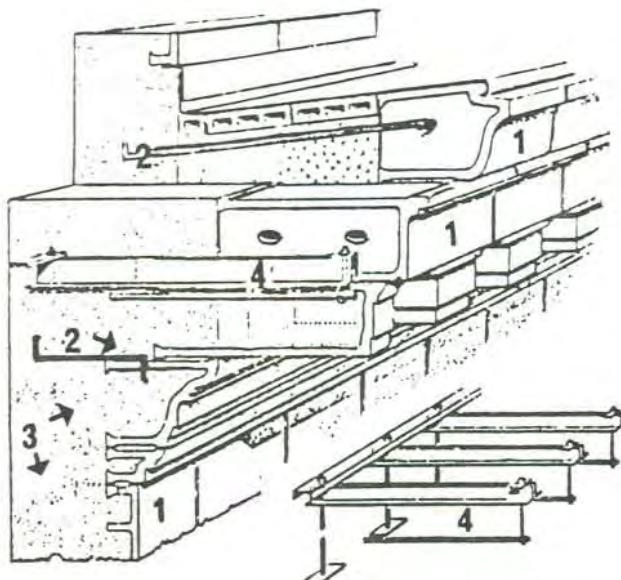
Typical Construction Detail of Glazed Architectural Terra-Cotta Ornament. Construction detailing was often complex. The terra-cotta units (1) which were laid in mortar were fitted with holes or slots to receive the metal anchors (2) (often called "Z" straps or "light iron") which were often fitted directly to the building frame. Masonry backfill (3) (either brick or poured cement) was laid between the terra-cotta units, with the building frame encasing the metal anchor. Overhanging or protruding elements were further secured by metal dowels or outriggers (4). (Detail, Architectural Terra Cotta, Charles E. White, Jr., 1920)
